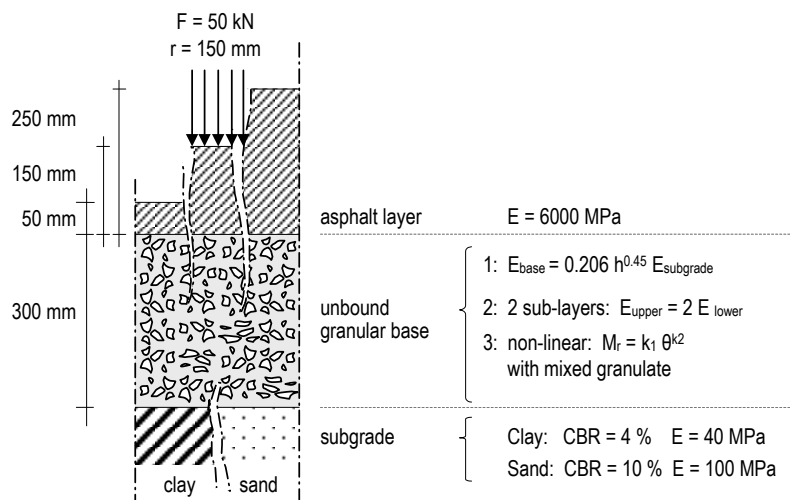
Pavement structures as evaluated with KENLAYER.
